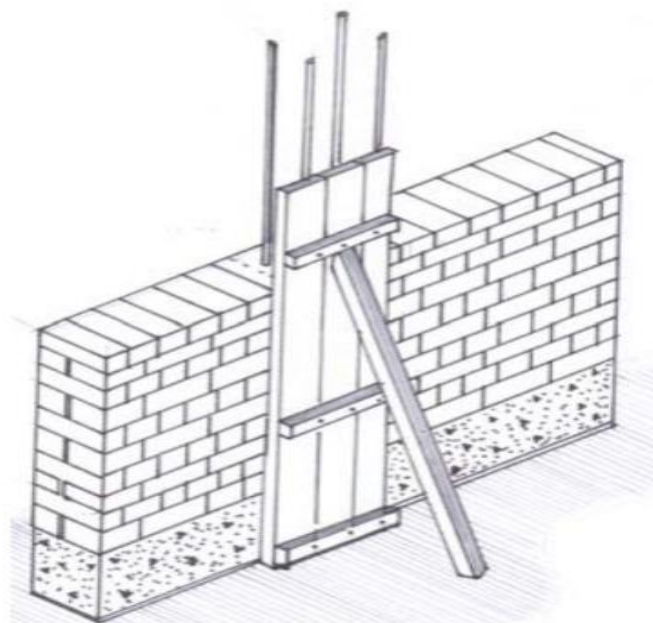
Formwork for tie-columns (*Meli et al*)
